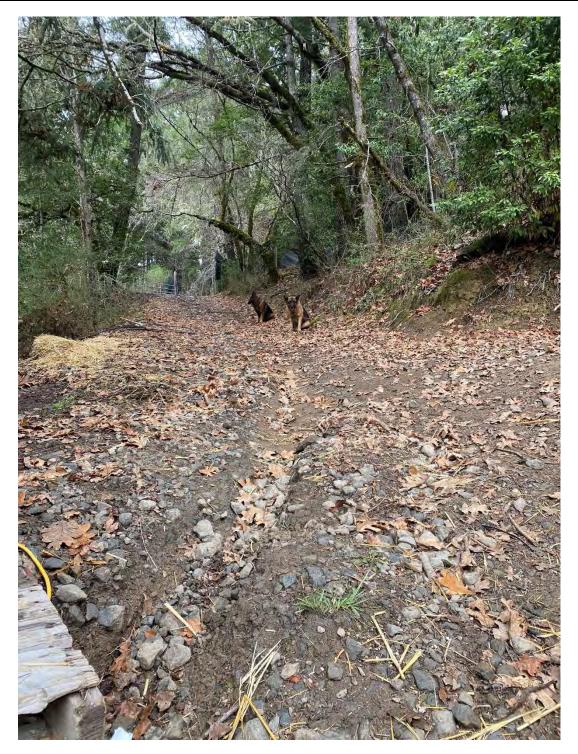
Drainage improvements draw storm water away from CA2. Photo by Permittee, 20 December 2024.
